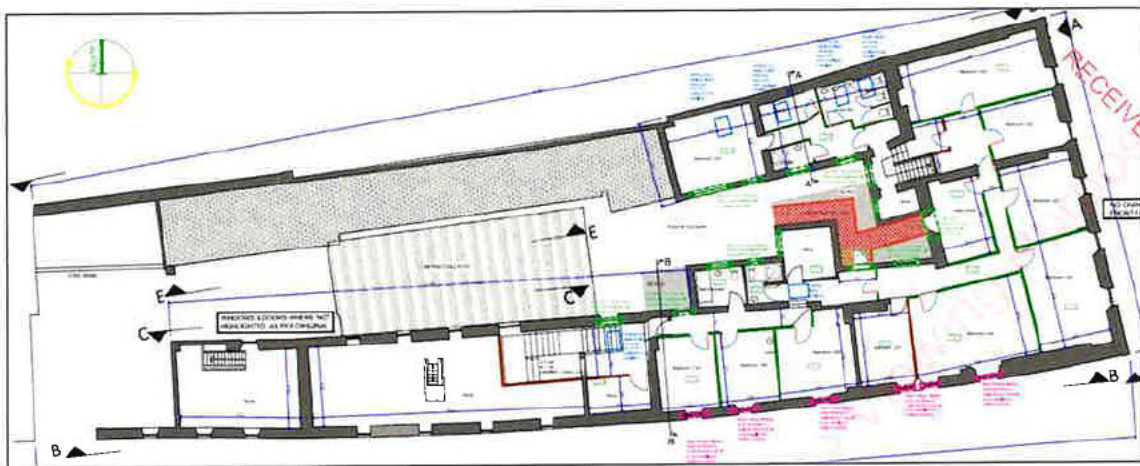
First floor plan of the development granted under Reg. Ref. 2460072.
